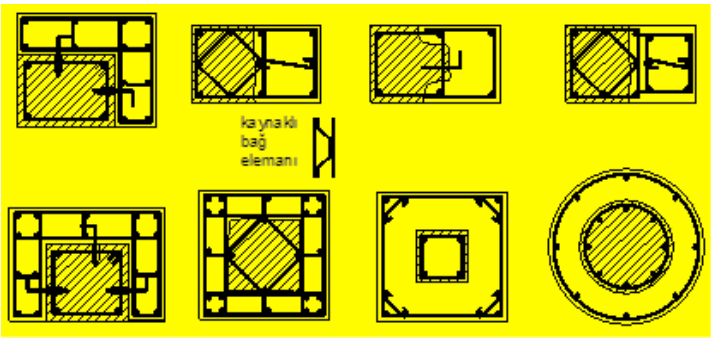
Strengthening of the Structural System by Applying Reinforced Concrete Wrapping to Columns (Celep, 2024)
